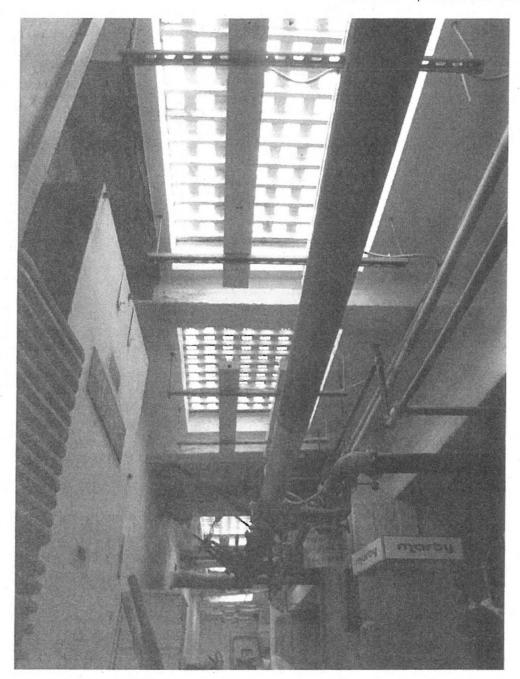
View looking up at the vault lights along the western wall of the basement level.
